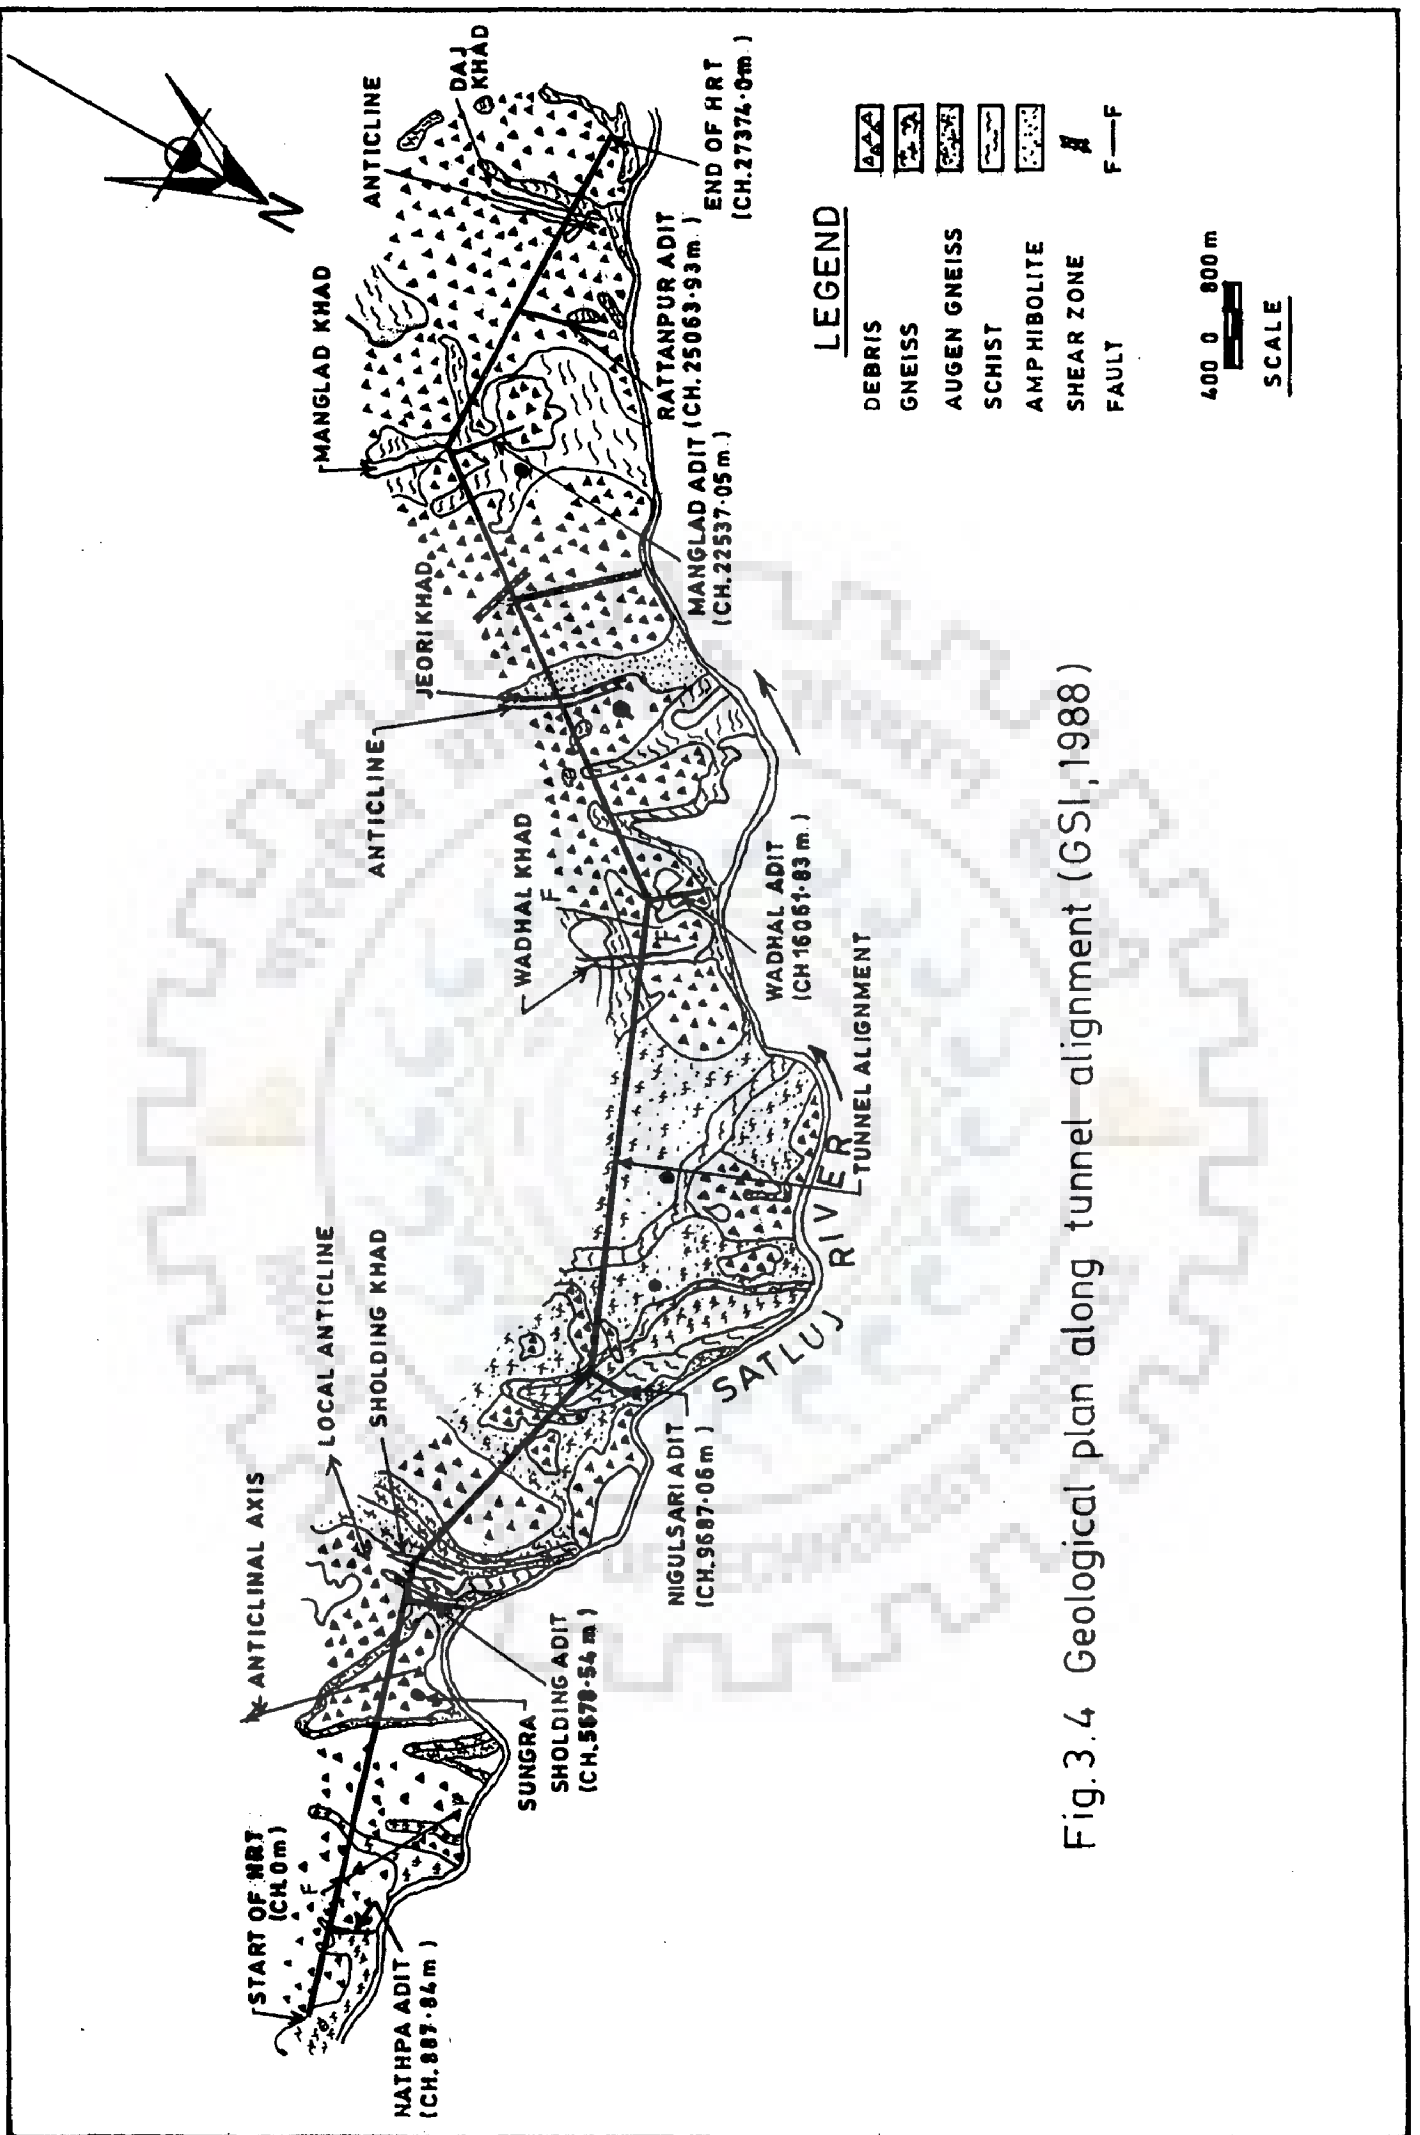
Geological plan along tunnel alignment (GSI, 1988)
